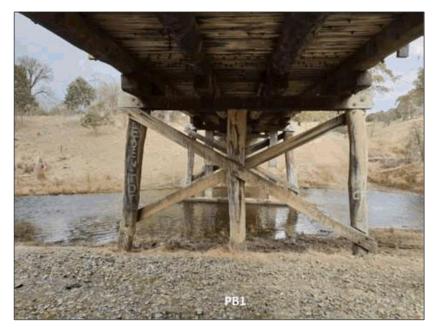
View of Pile Bent 1 looking towards Abutment 2. The bent consists of three piles and two cross braces. All three piles visually appear to be in a fair condition, with the exception of the compression cracking that has occurred on Pile 2, due to an inaccurate connection detail of the headstock to the post. All three intermediate bents have this inaccurate connection detail. See Section 2.1.2, after the pictures in this section, which discusses proper split headstock connection details. This bent should have a wale installed.
